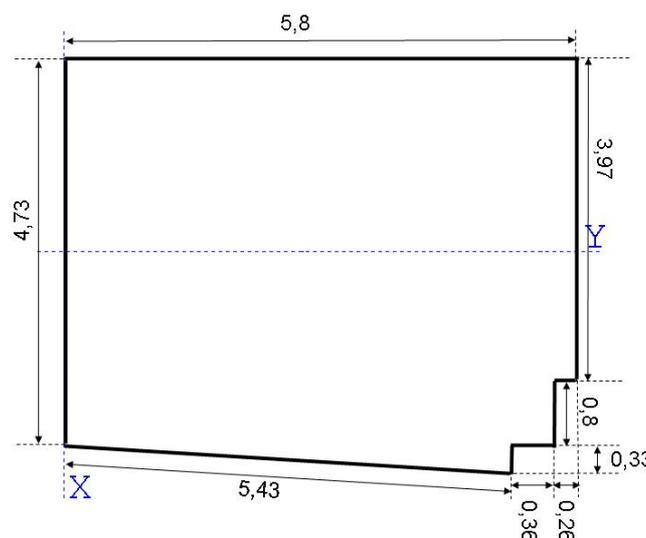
Floor plan of the room provided by JOANNEUM RESEARCH
